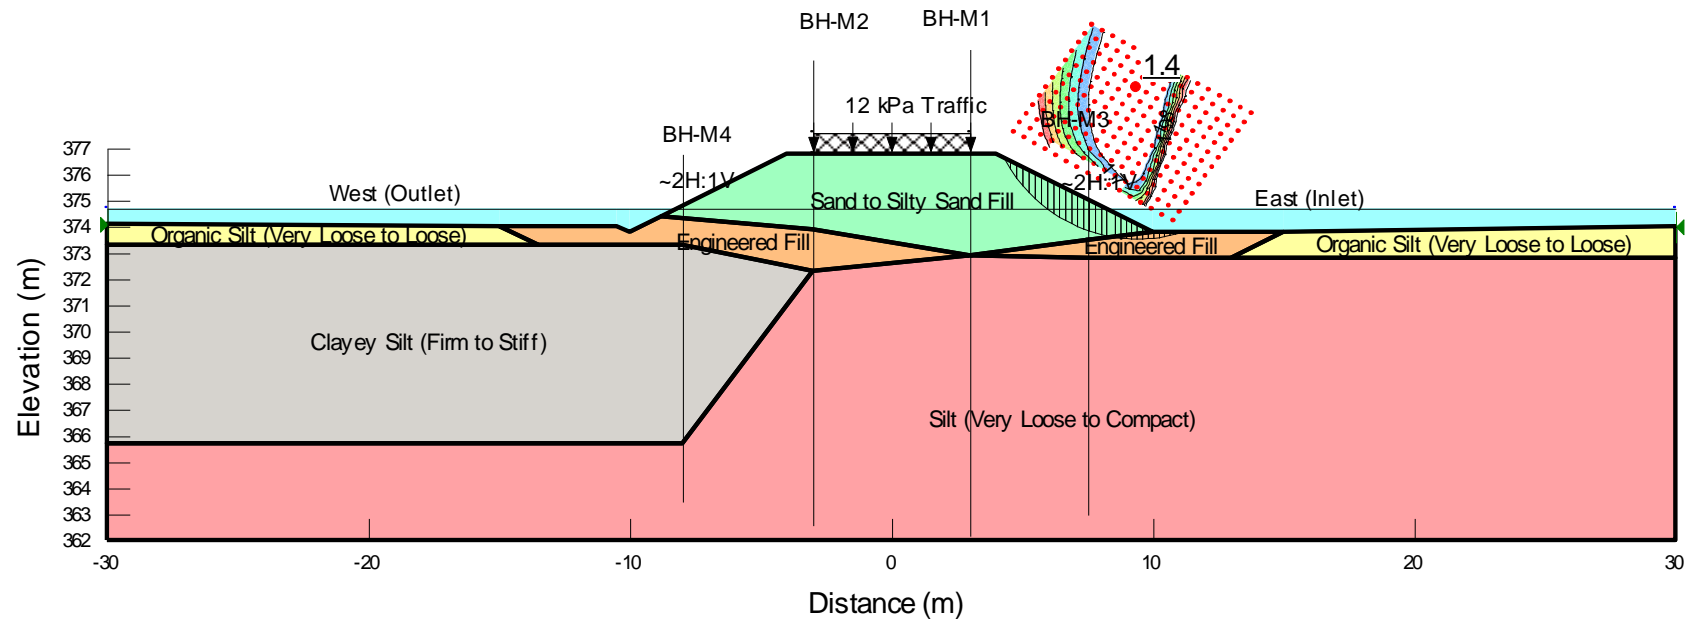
East slope of new embankment (inlet) – drained static condition with 2H:1V slope and engineered fill below embankment
